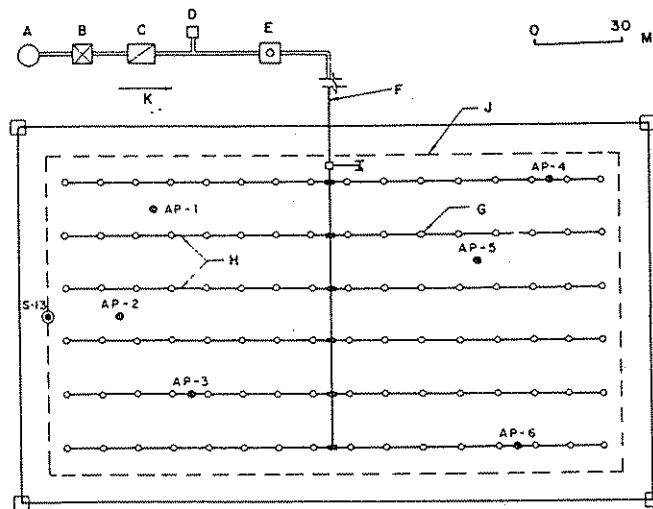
Moistening of cohesive soil in the borrow area. Layout of sprinkling test (Prusza V. & Choudry 1982).
